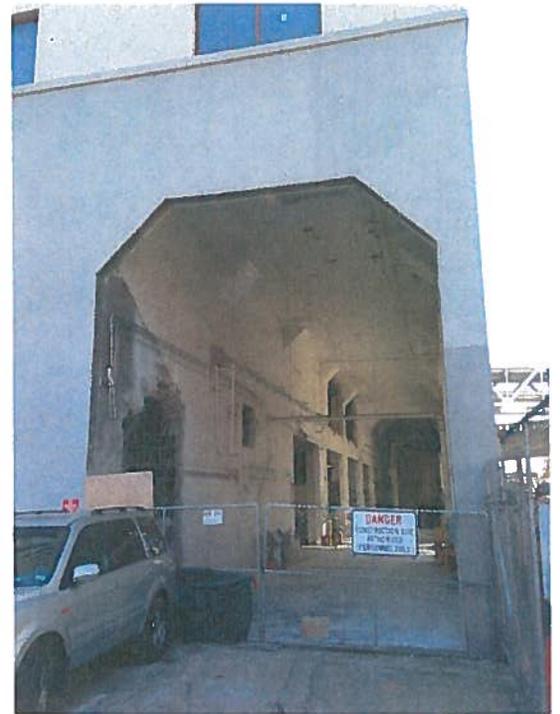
Corner of Rincon Place and Beale Street. This former railcar entry will be the future retail entry.
